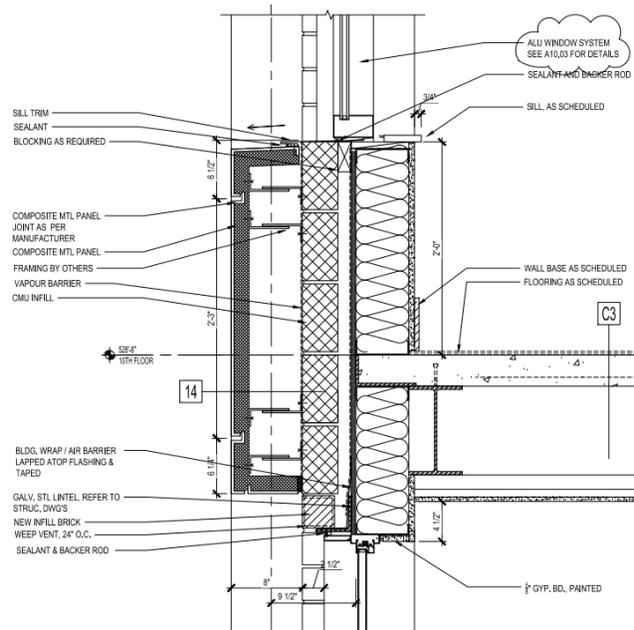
Section through typical exterior wall in addition. From 4A.21.
